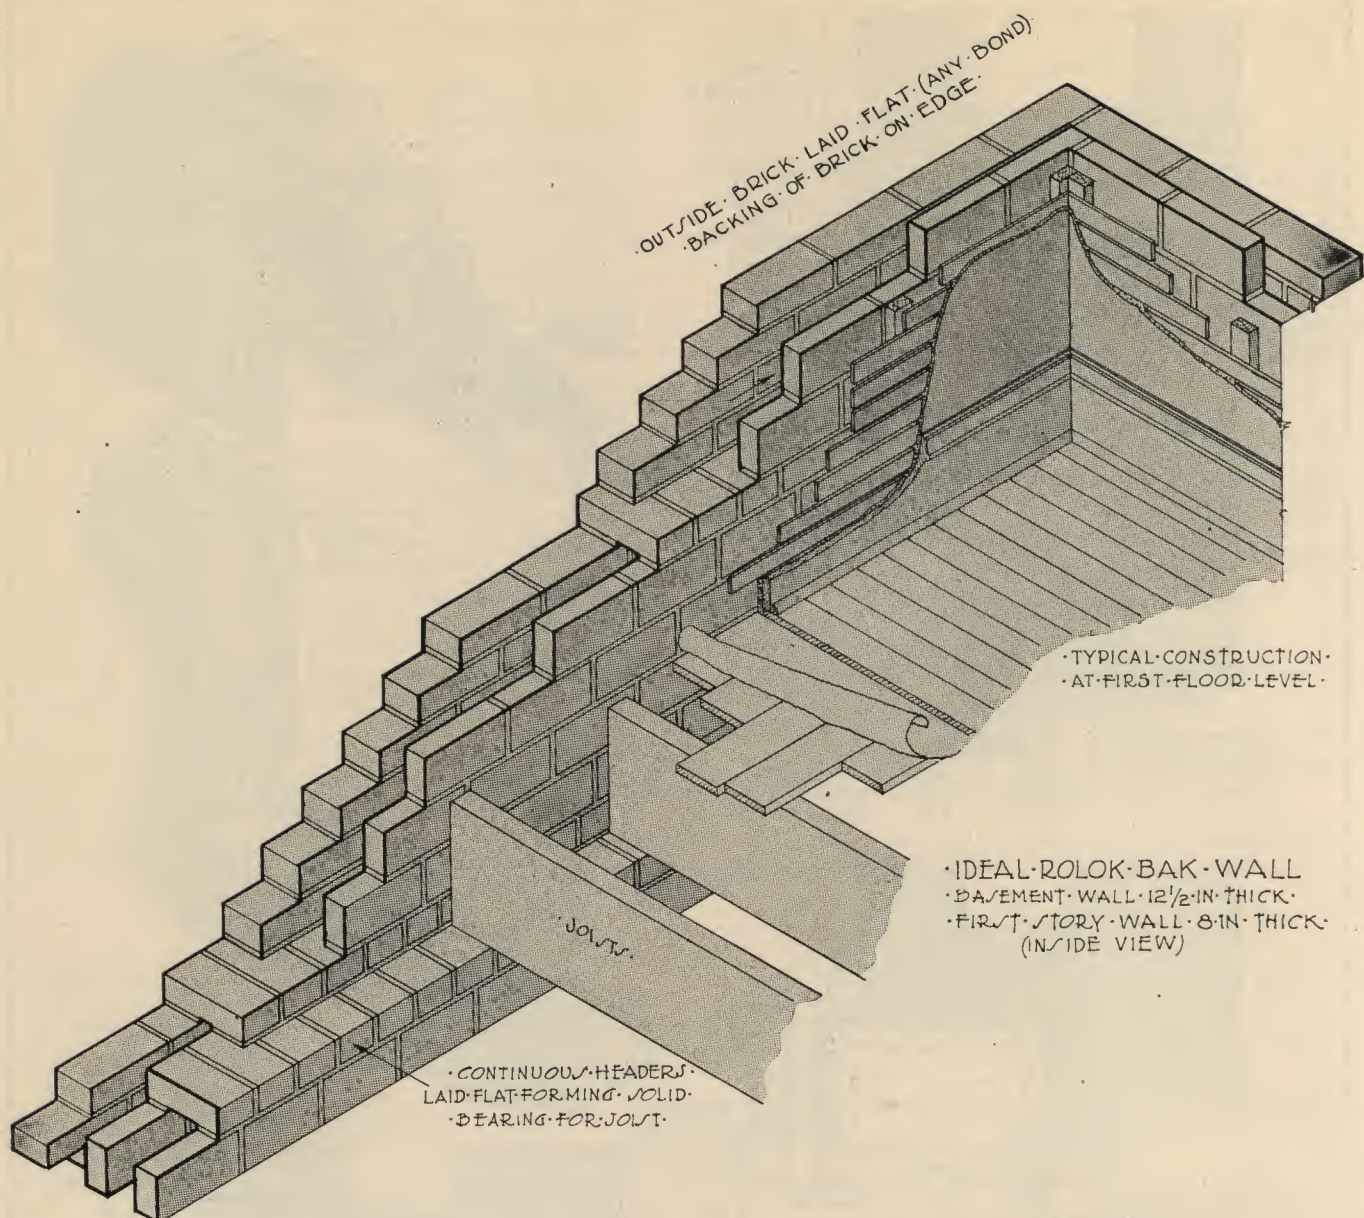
Typical construction detail at first floor level, 8" rolok-bak wall with 12" rolok-bak basement wall.
